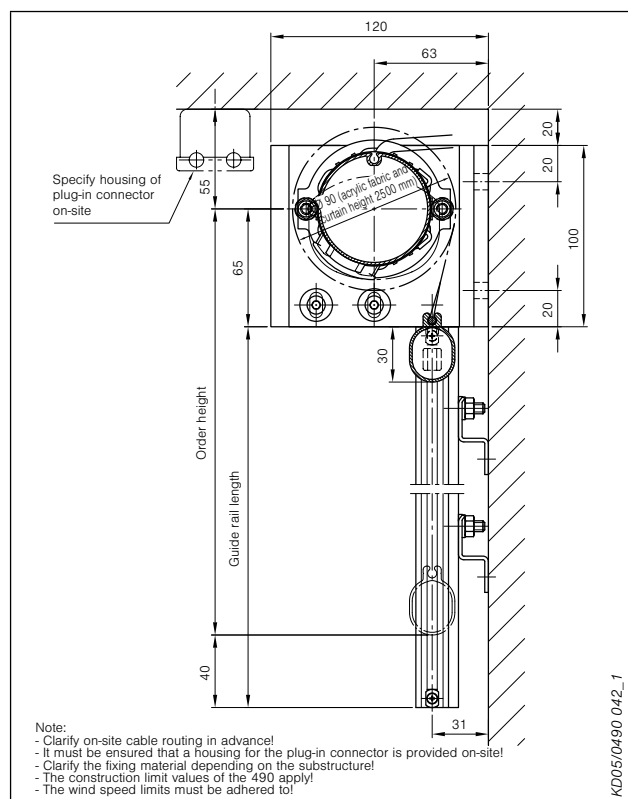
Vertical awning 491 with motor, left rolling blind with guide rails and wall installation
